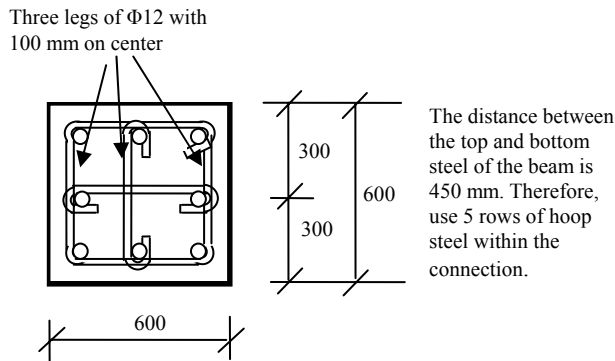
Steel reinforcement in the cross section of the connection (Dimensions in mm).
